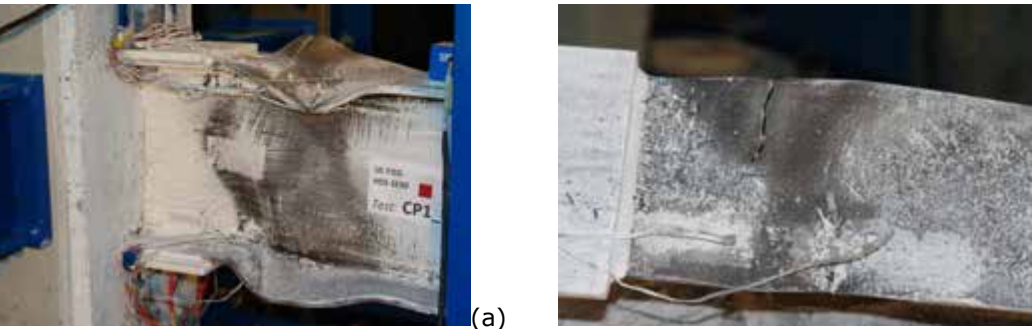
Specimen CP1.1 after the failure: a) overall view: beam local buckling with the spread of plastic zone (darker region), b) detail of fracture in the top beam flange
